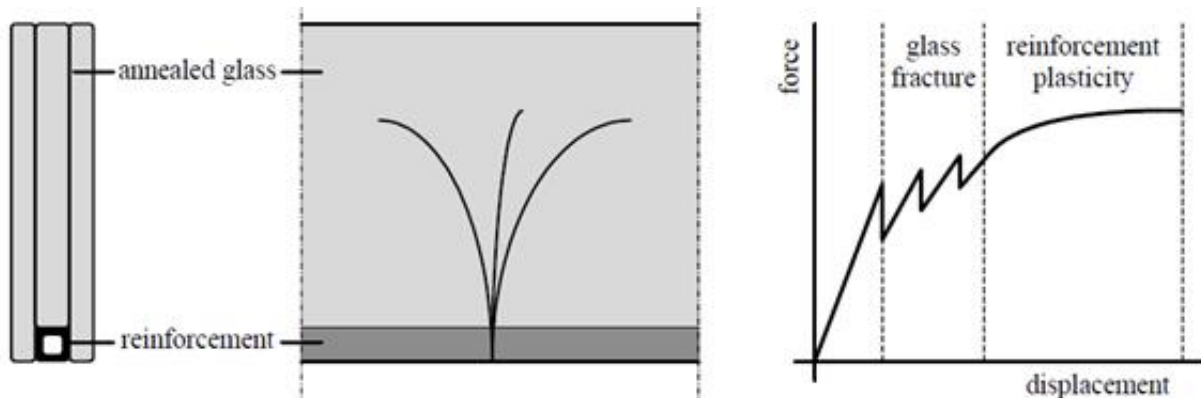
Reinforced glass beam cross section and its Ductility (Louter, 2011)
